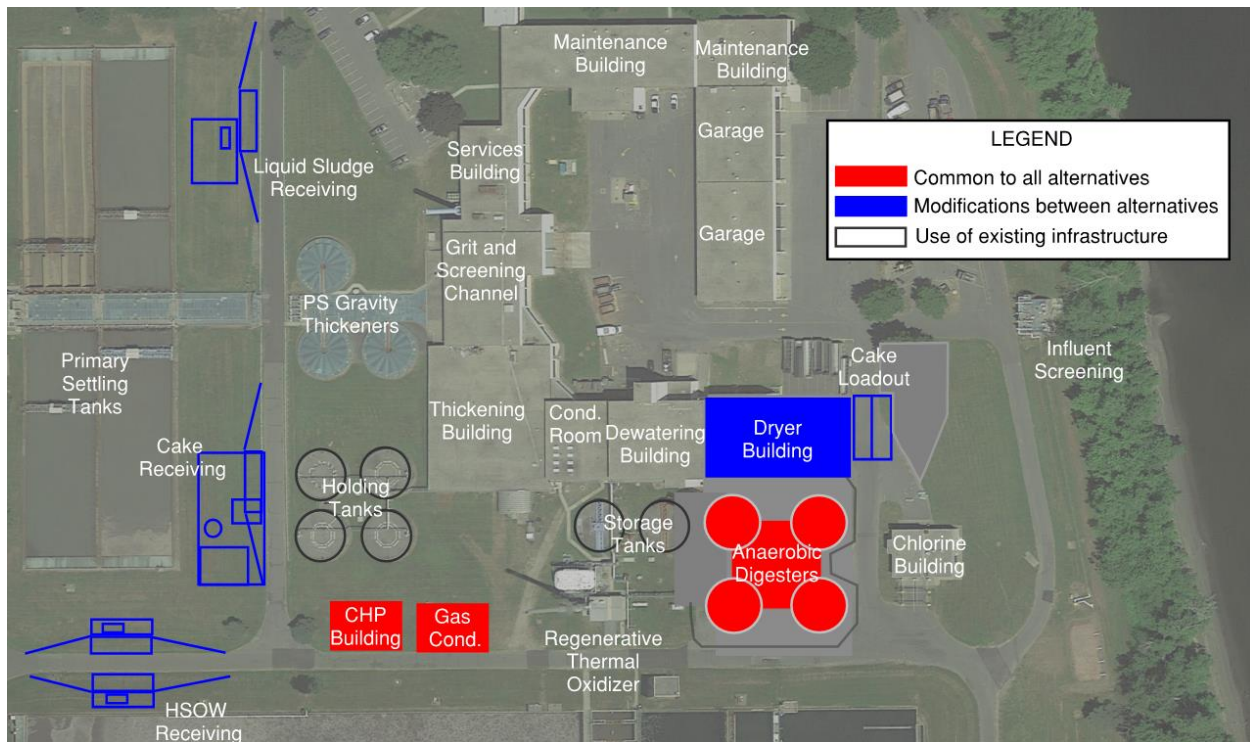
Conceptual site layout of new facilities for bioenergy generation
